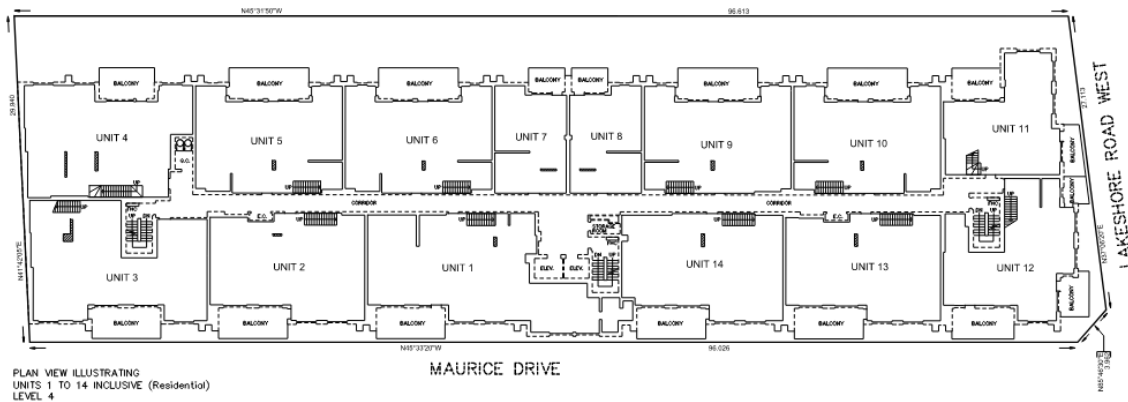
Draft Plan of Condominium Floor 4 and Rooftop Terrace
